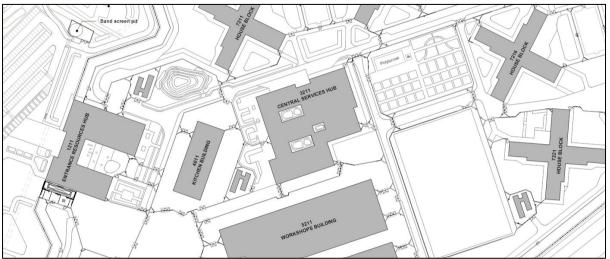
Extract of layout plan indicating provision of security fencing and security gates within the site
